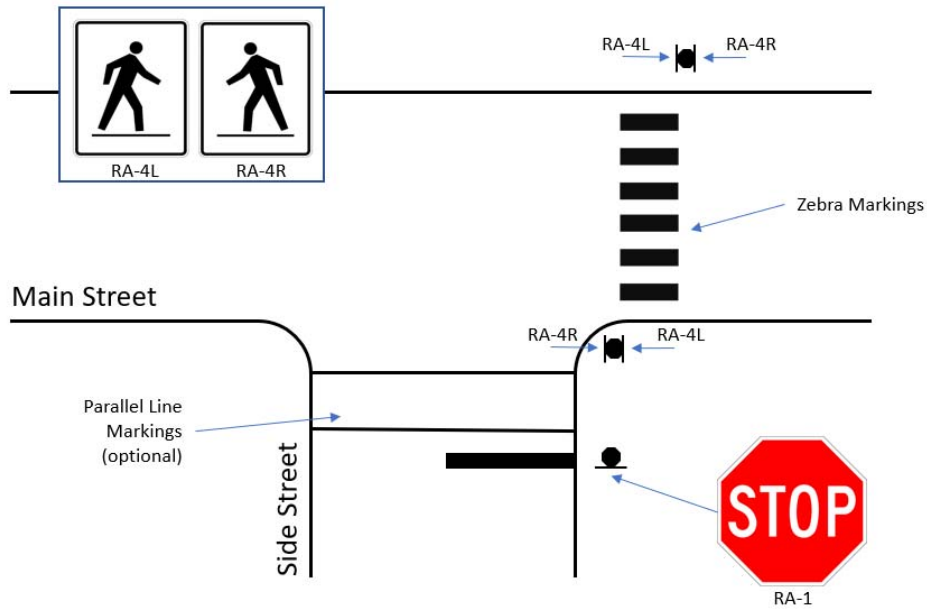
Typical Crosswalk Signage and Pavements Markings – STOP Controlled Intersection
